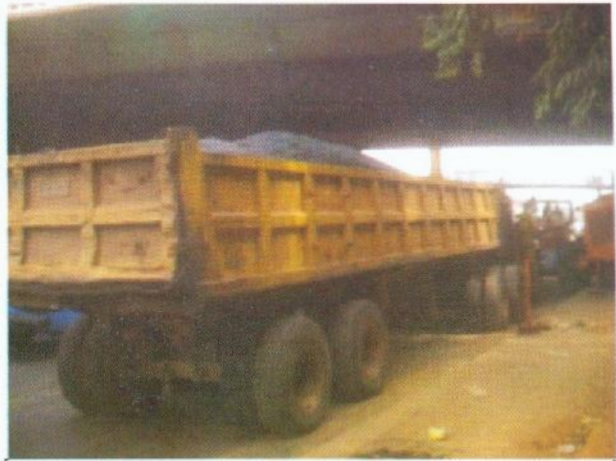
A 30-tonne trailer tipper loaded with asphalt concrete, waiting at road repair site location
